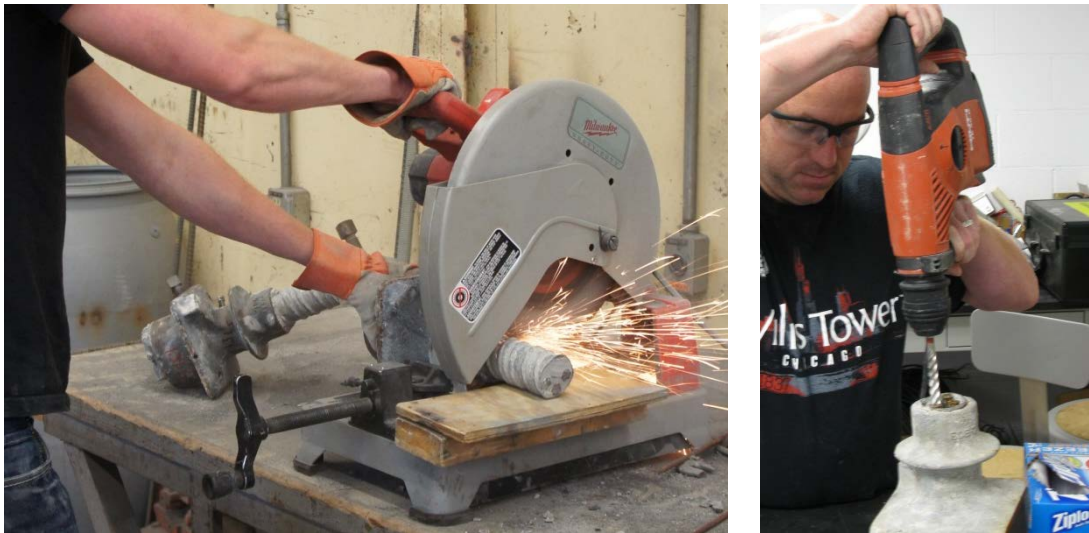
Anchorage Zone Concrete Powder Sample Location<sup>2</sup>
